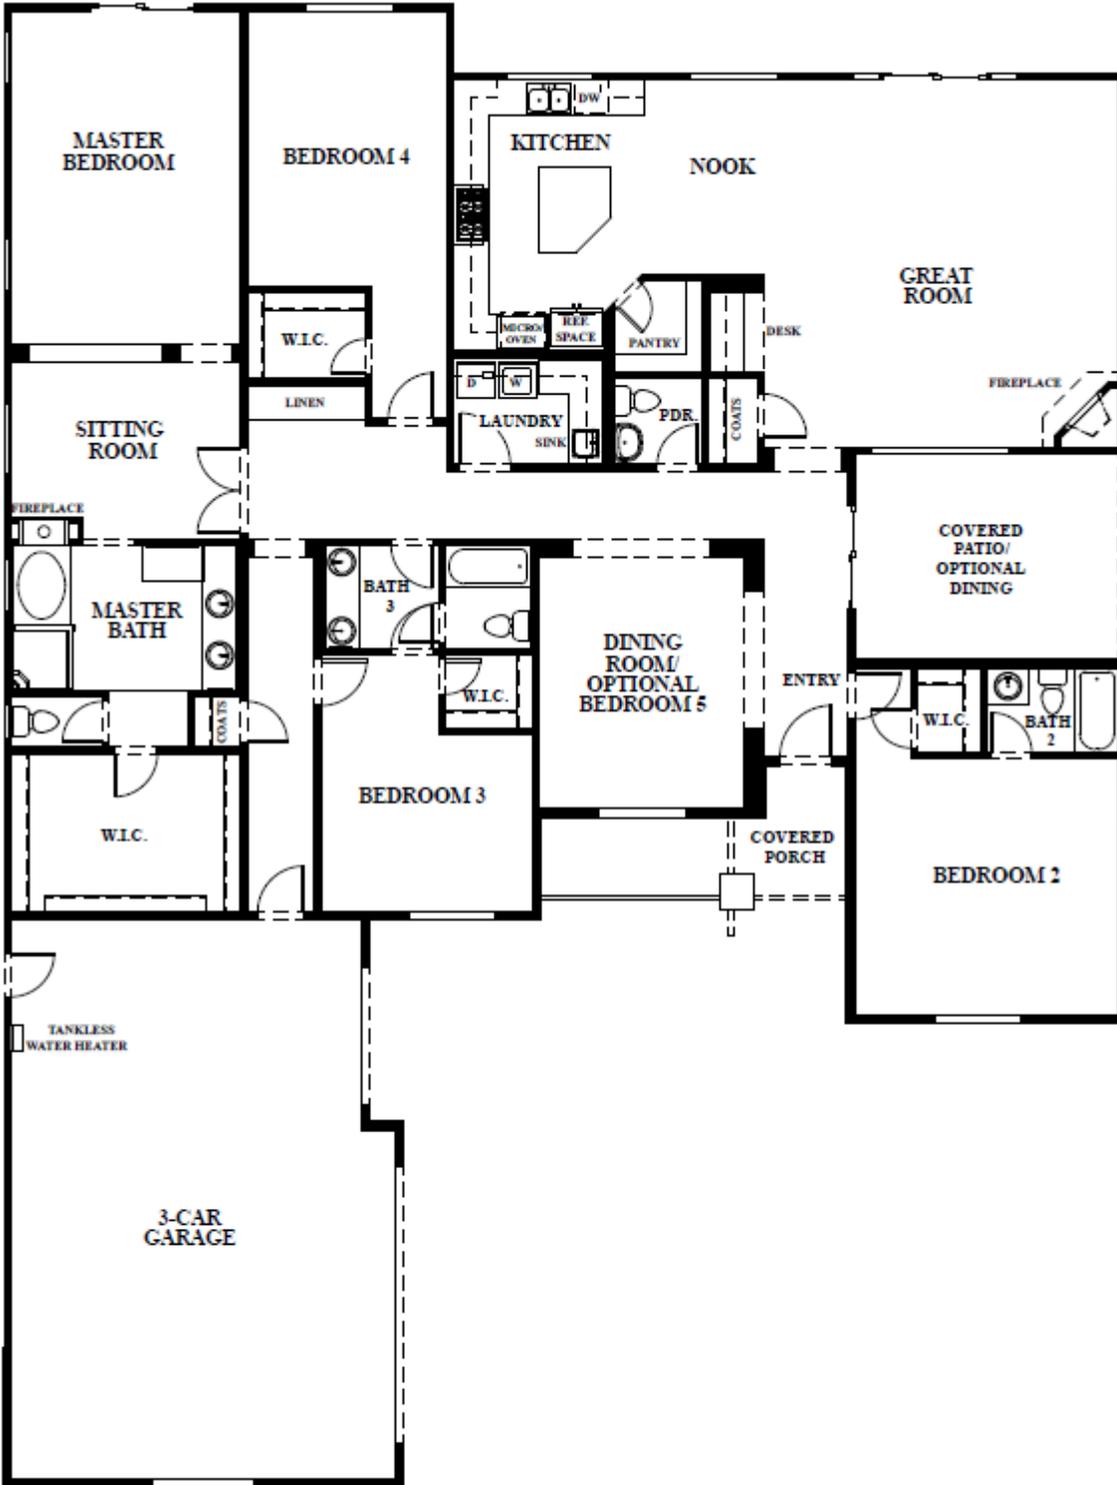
Exhibit C: Conceptual Site Plan/Floor Plan/Elevations
